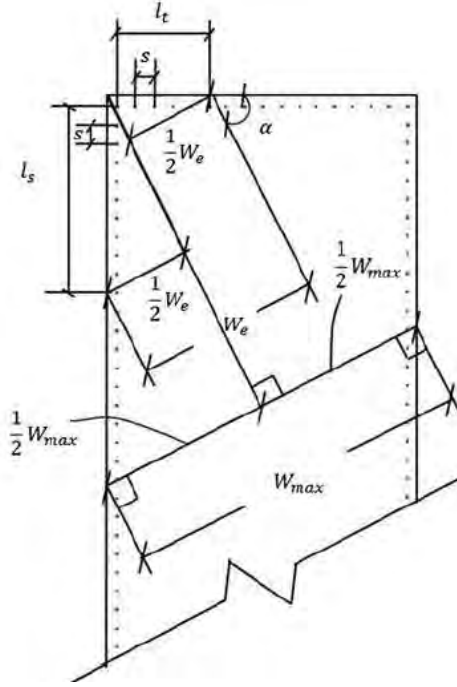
Illustration of effective strip width and maximum effective strip width on a typical sheathing-to-frame fastener connection layout (Yanagi and Yu (2014)).
